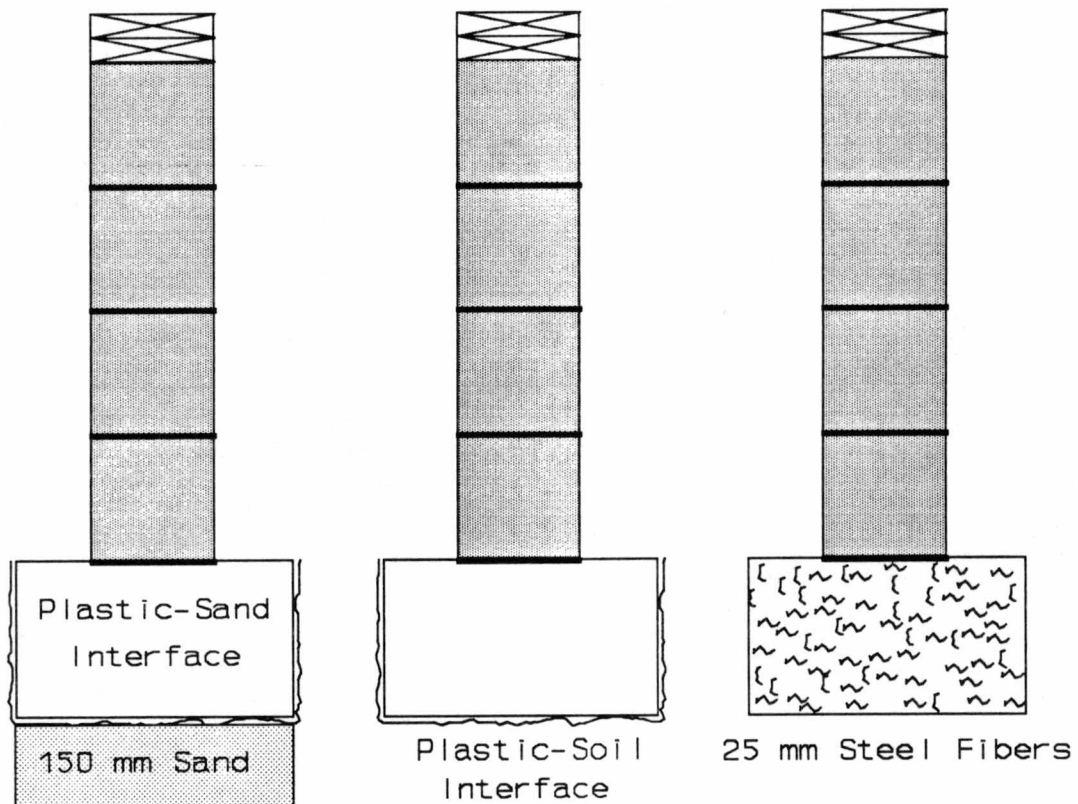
Plastic-on-Sand, Plastic-on-Soil, and Steel Fiber Footings
